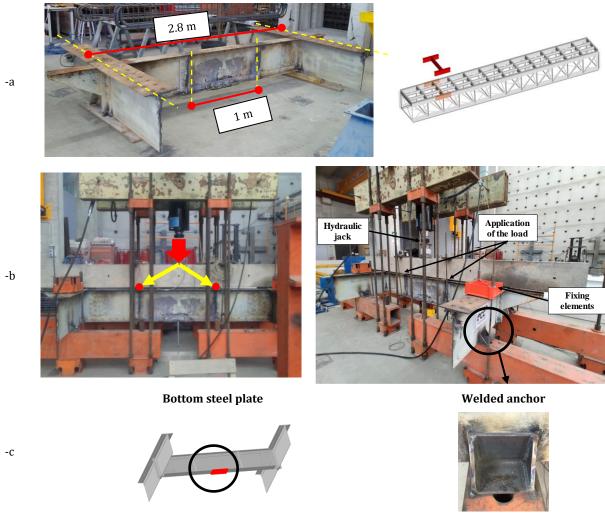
Geometry of the riveted truss beam tested (-a), experimental set-up (-b) and details of the beam and welded anchors (-c).
